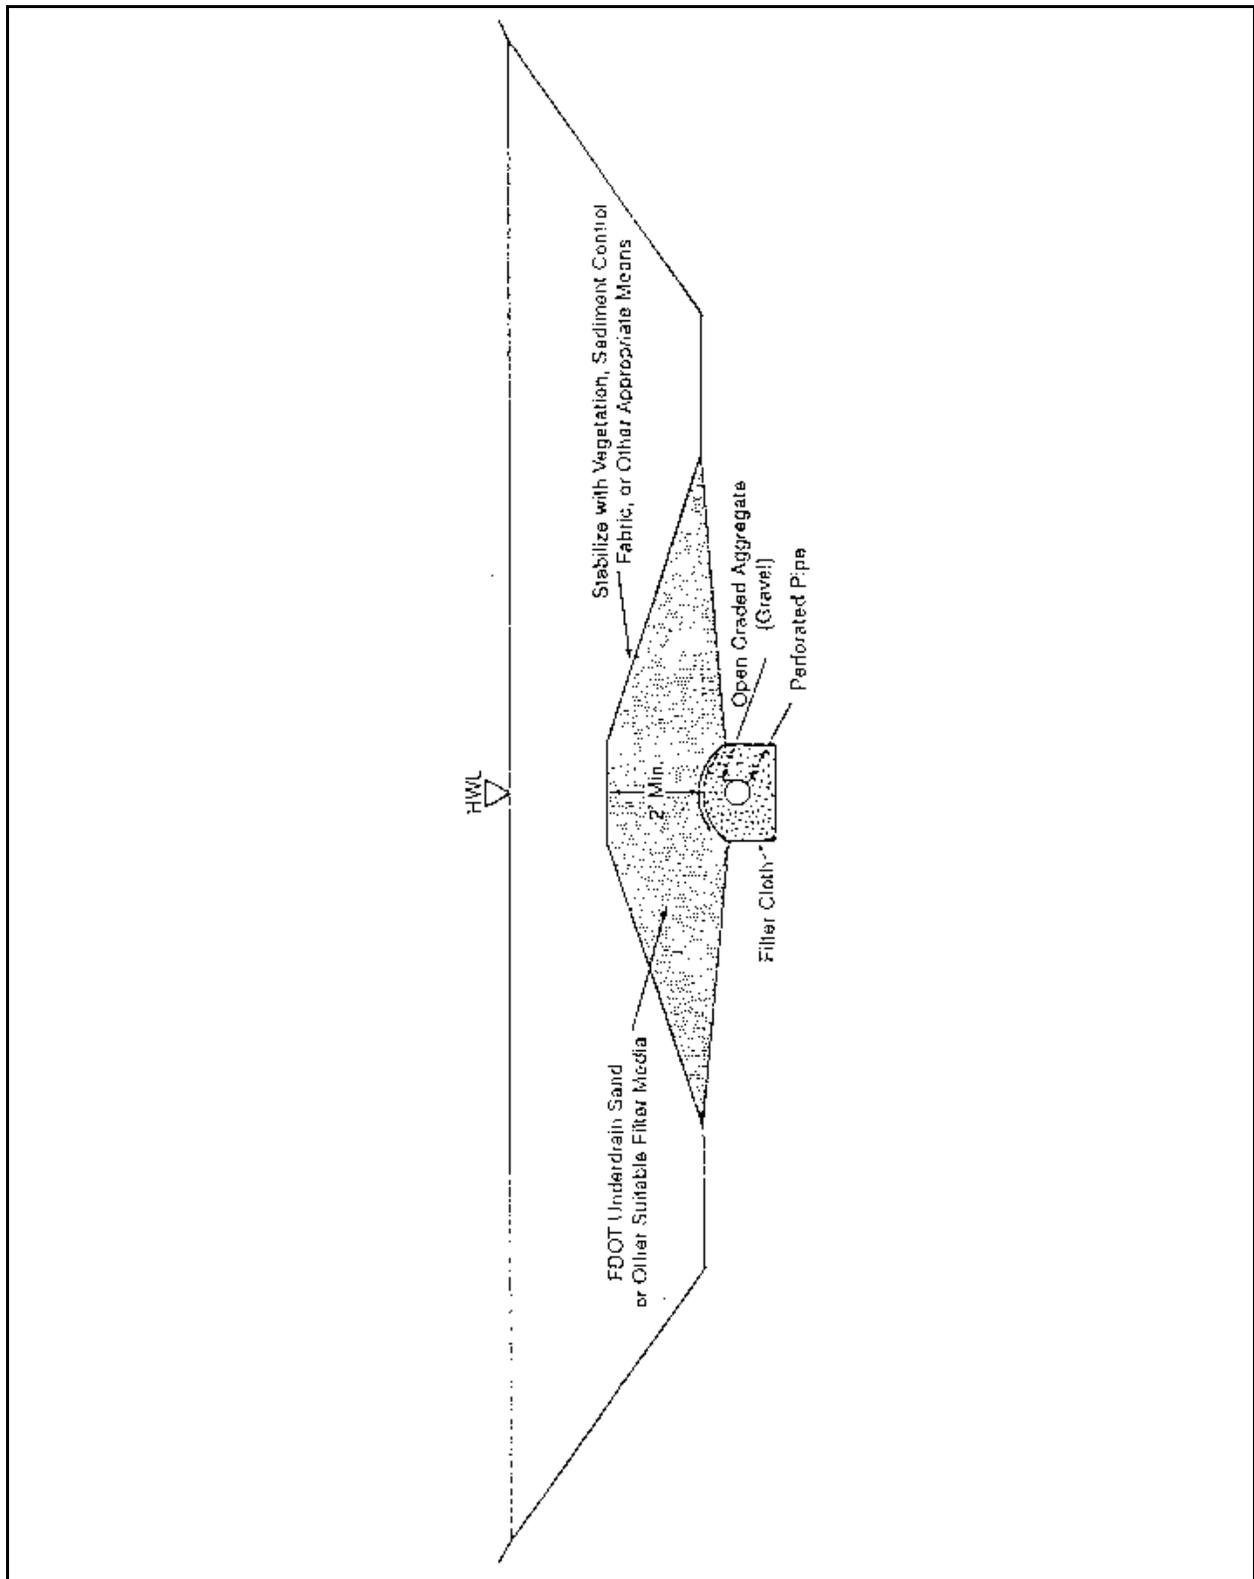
Typical Cross-Section of Elevated Sand Filter for Stormwater Treatment used in Conjunction with Dry Detention Facility
